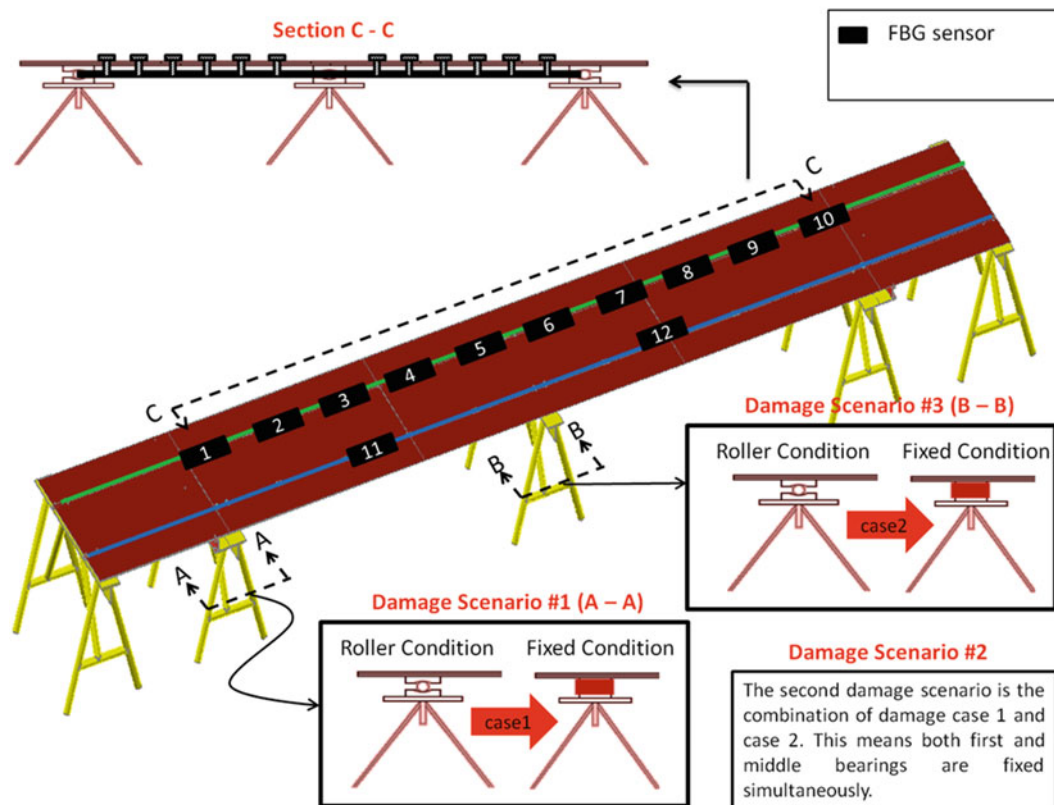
Location of sensors and simulated damage (UCF 4-span Bridge)
